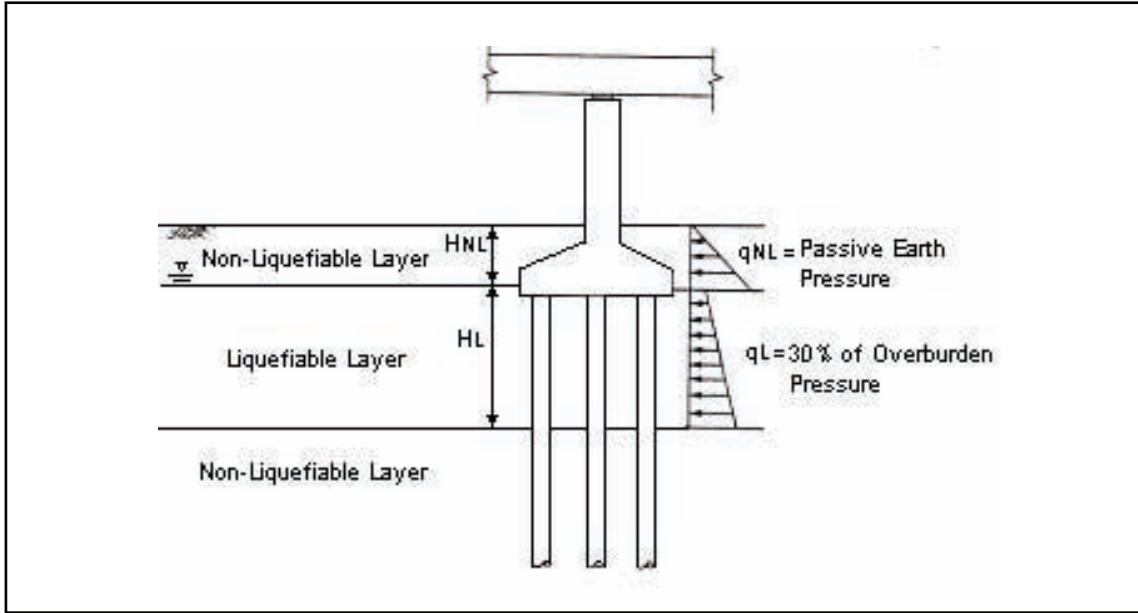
Proposed limit equilibrium design method of bridge pile foundations against lateral spreading in Japan (Japan Road Association, 1996; Yokoyama, et al., 1997)
